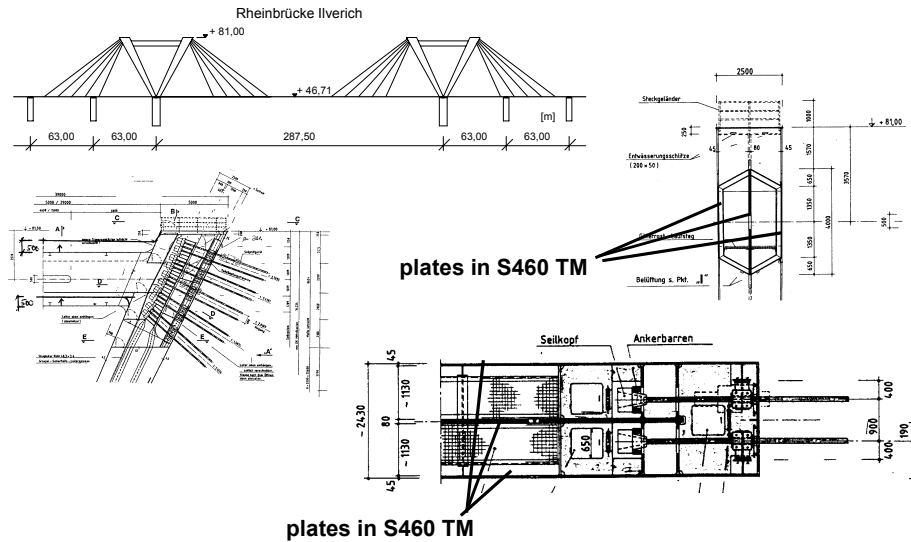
Horizontal tension element of a ∇ -pylon
